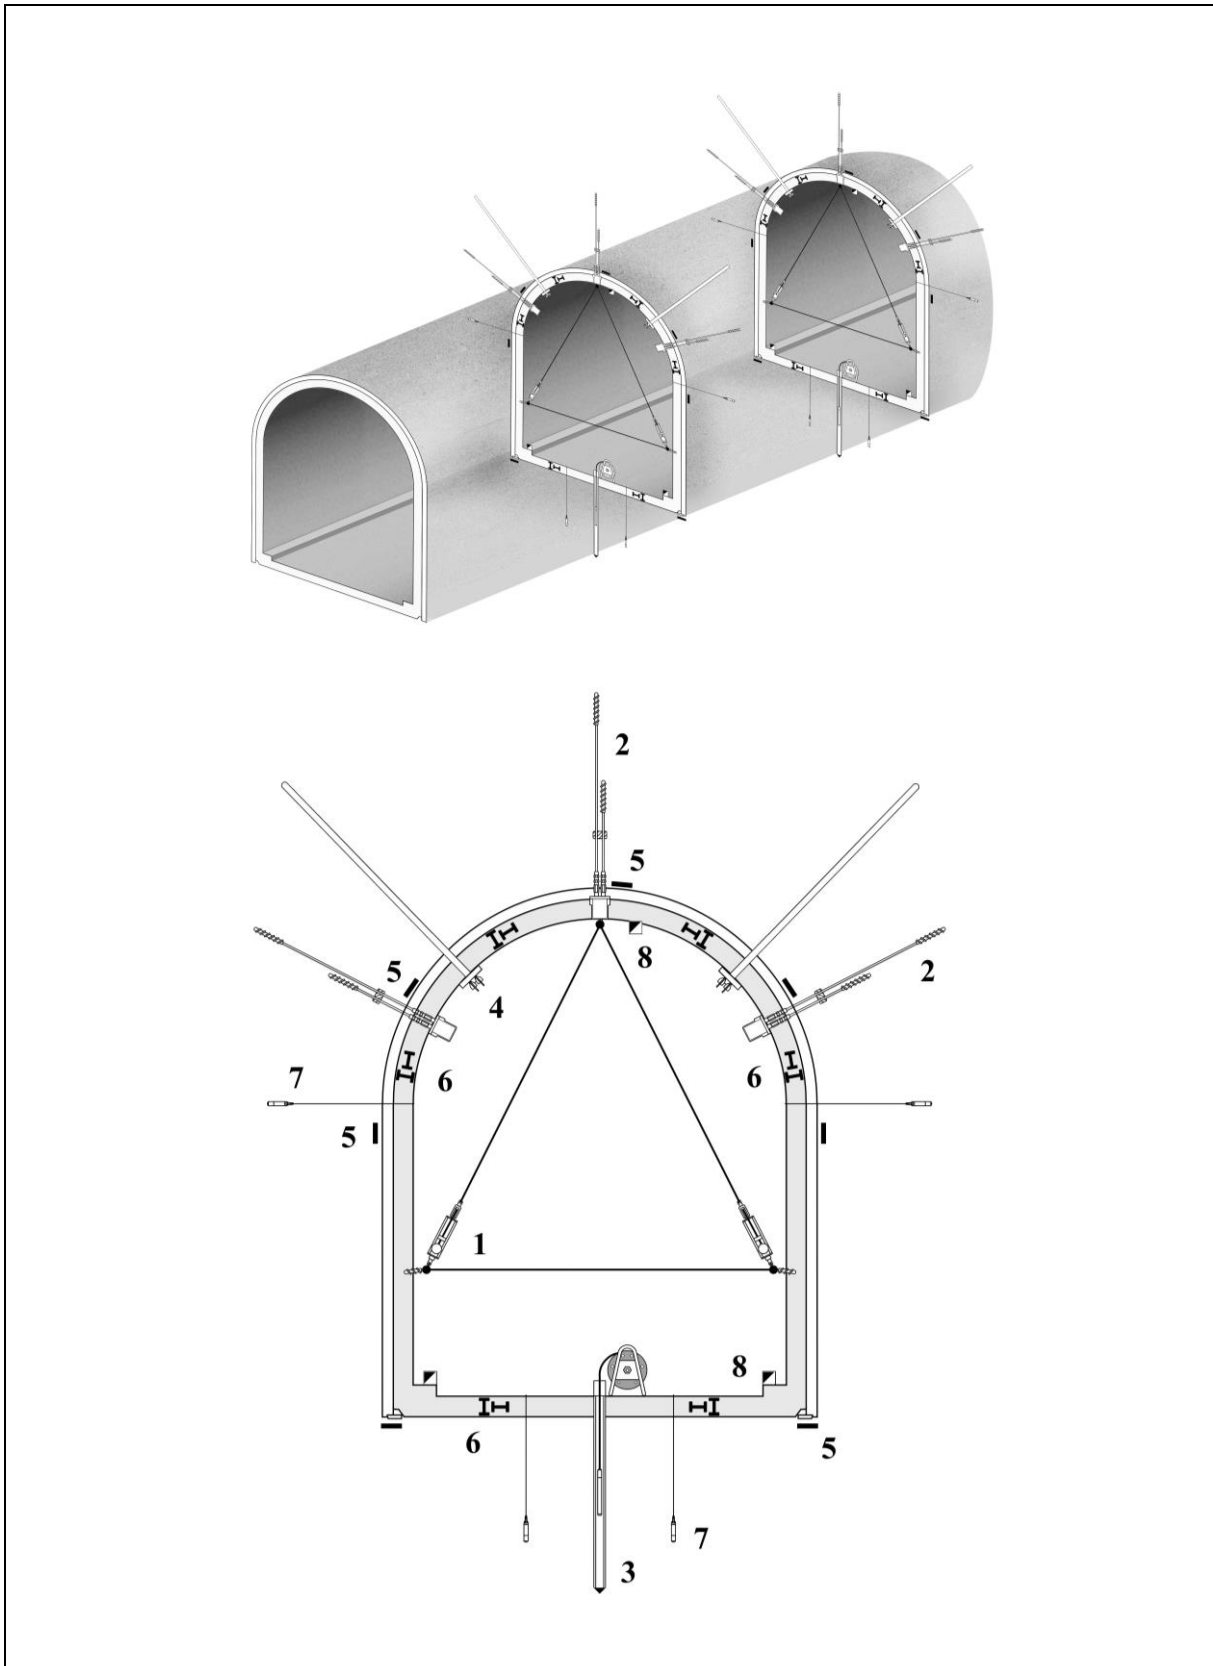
Schematic Layout of Typical Monitoring for an Underground Excavation – Isometric View and Cross-section
